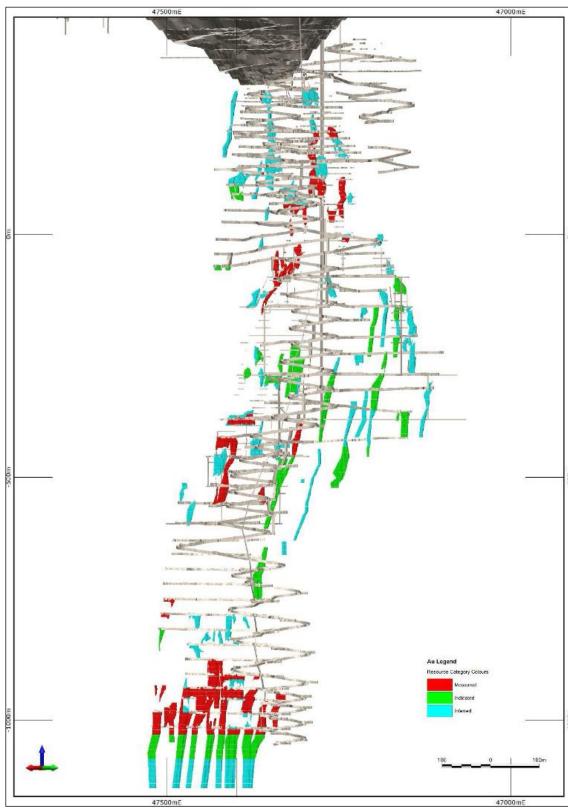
Hill 50 Underground mine LOM plan stopes
